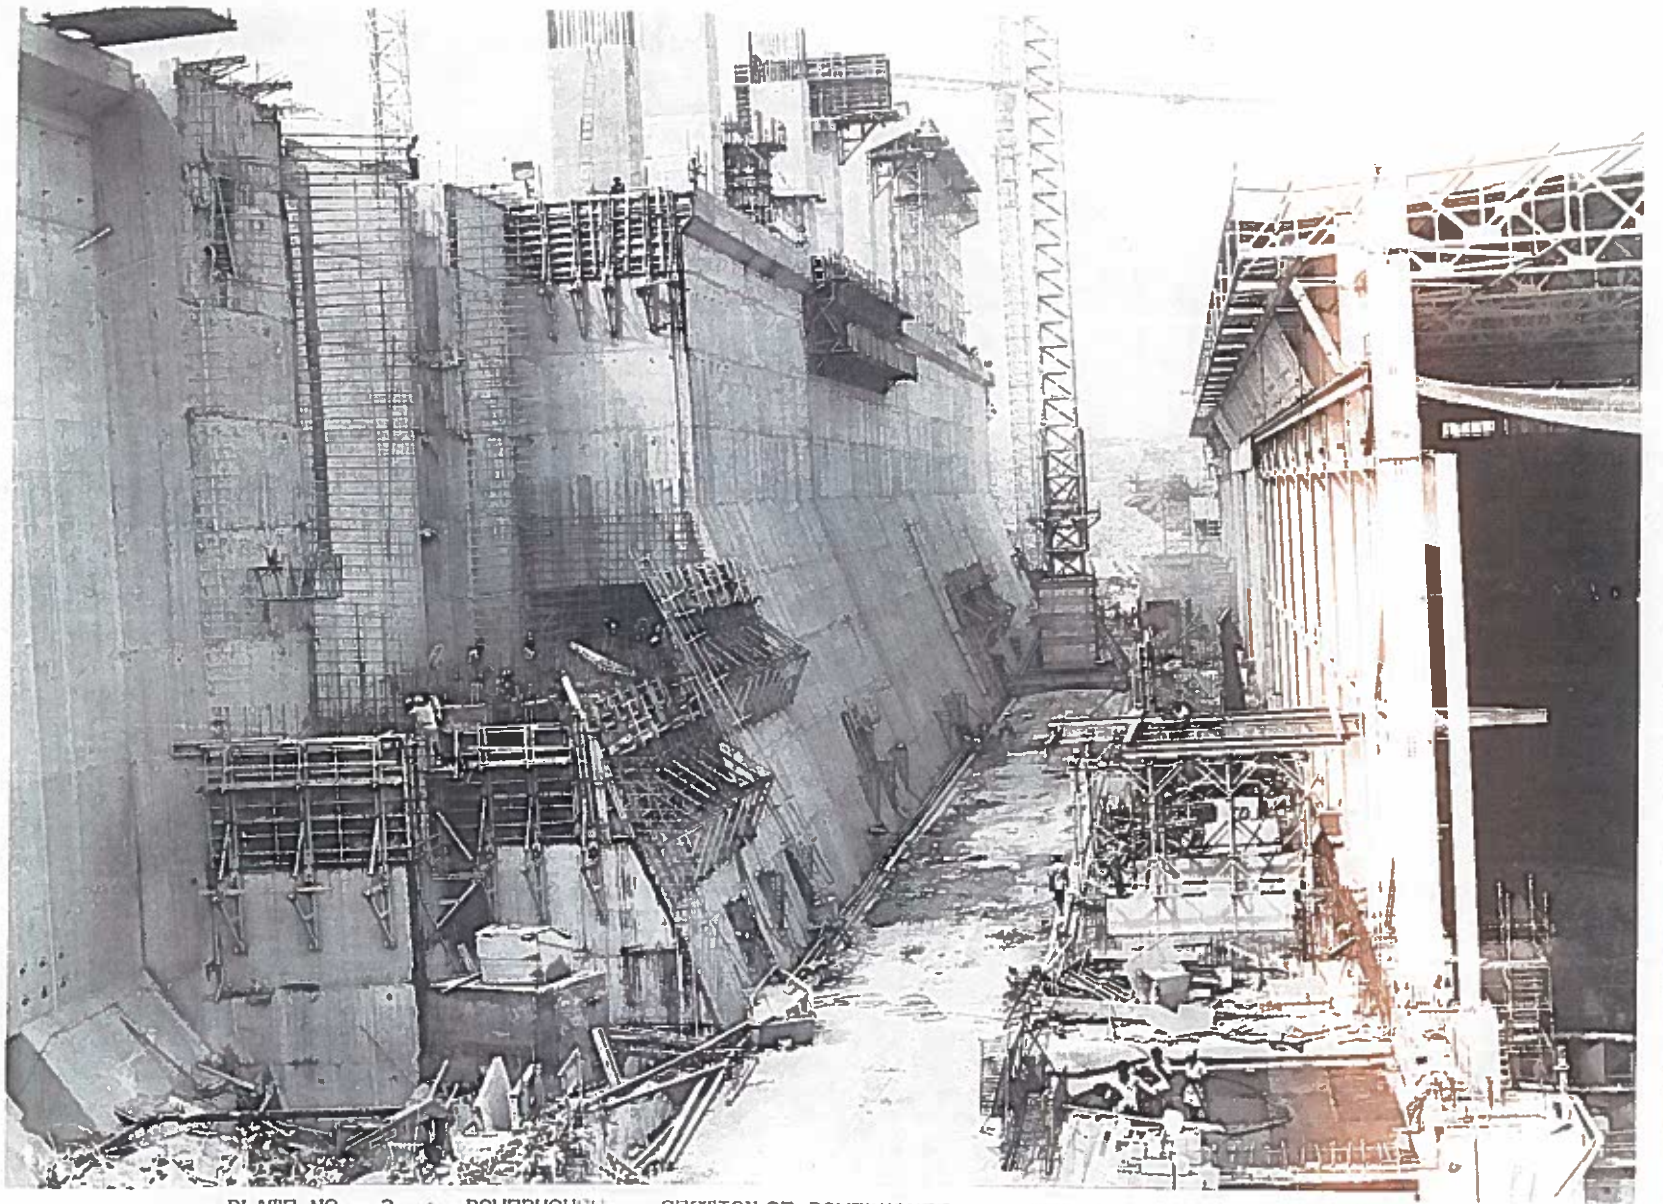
POWERHOUSE : SECTION OF POWERHOUSE AND INTAKE
